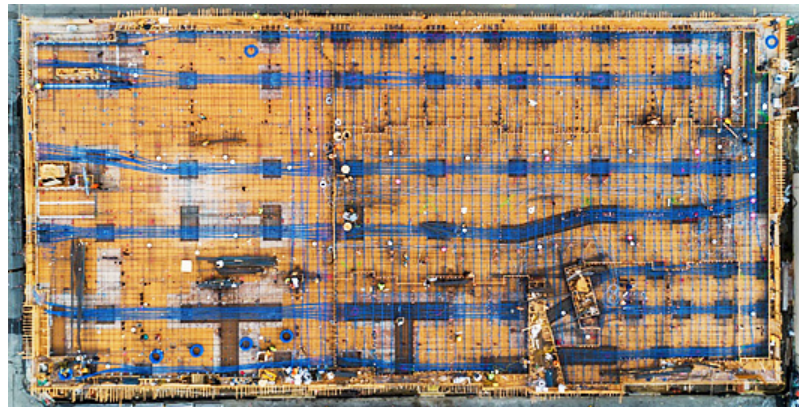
An aerial view of a PT floor system shortly before concrete placement. (Images courtesy of PTI.)
